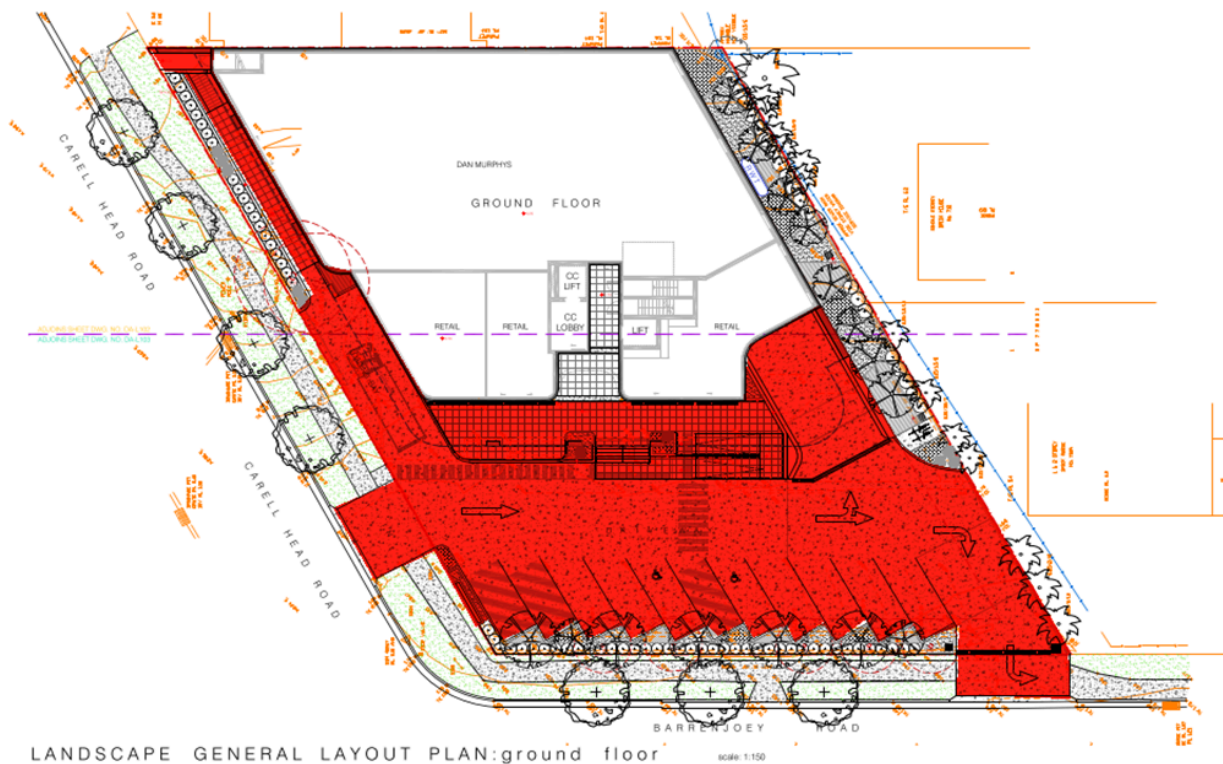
Trees 1 and 2 TPZ overlaid to the proposed ground floor level
